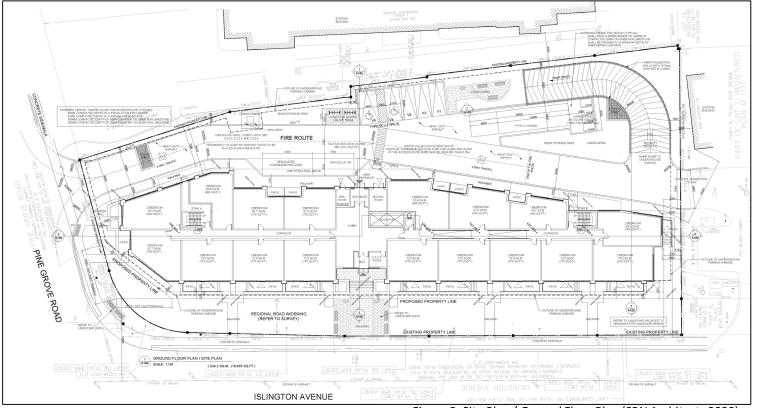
Site Plan / Ground Floor Plan (SRN Architects 2020)
